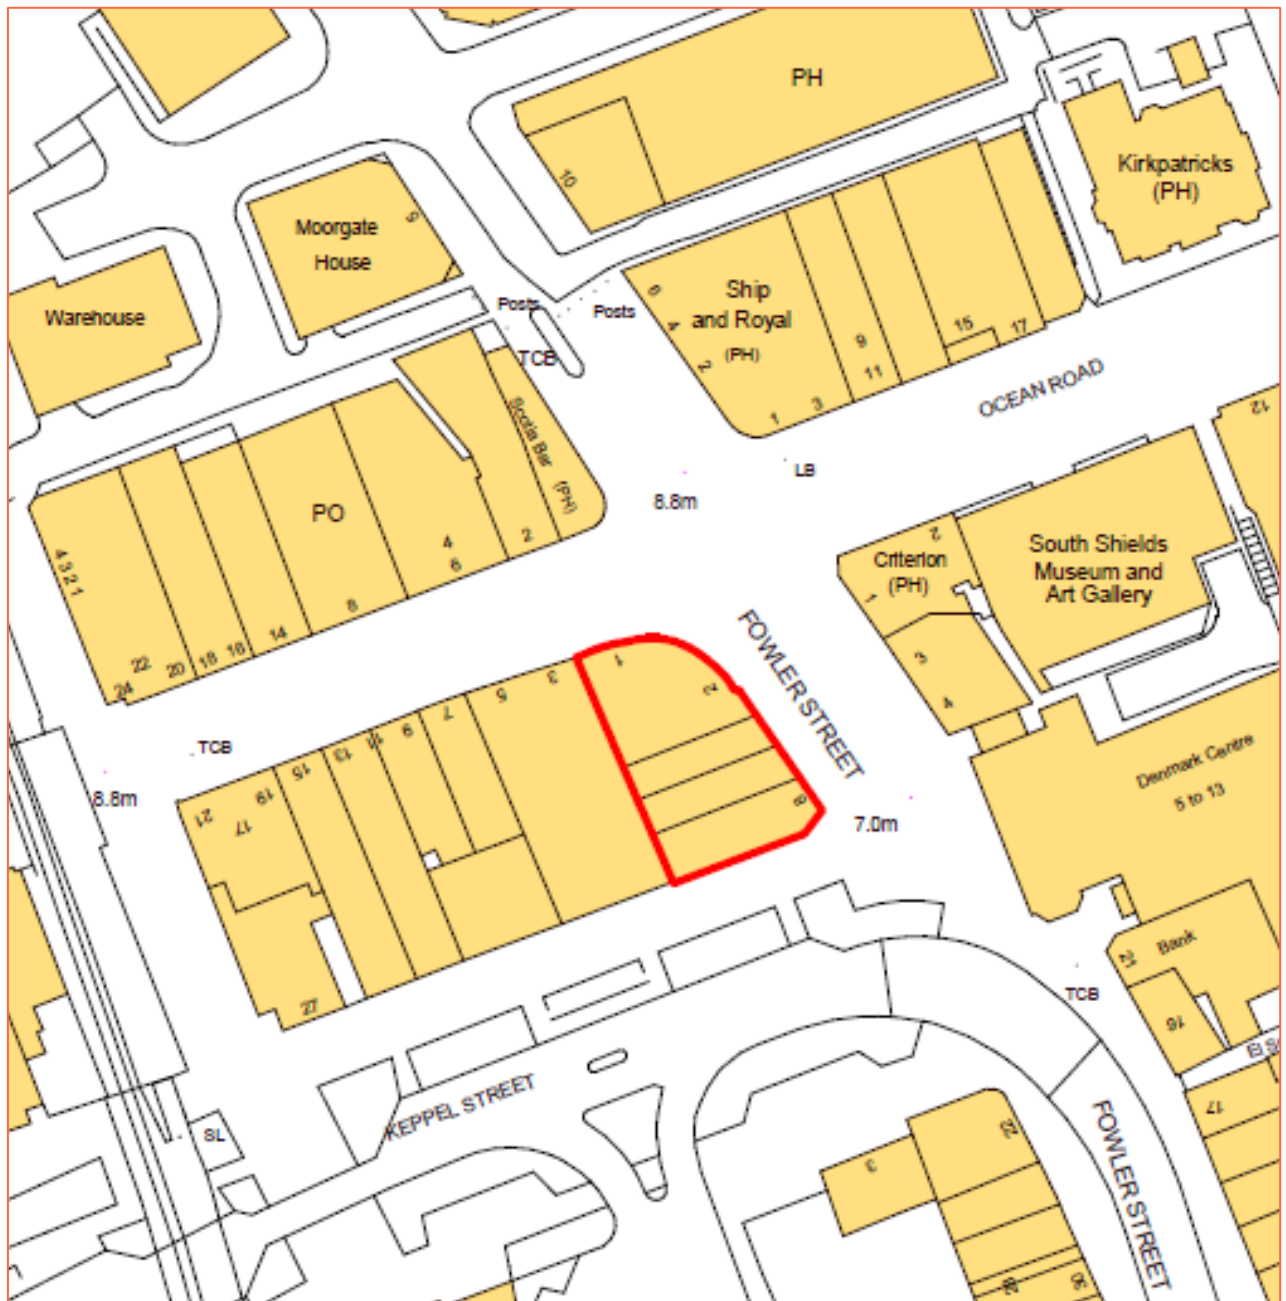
Site Location Plan – King Street (Source: Create Architecture)
